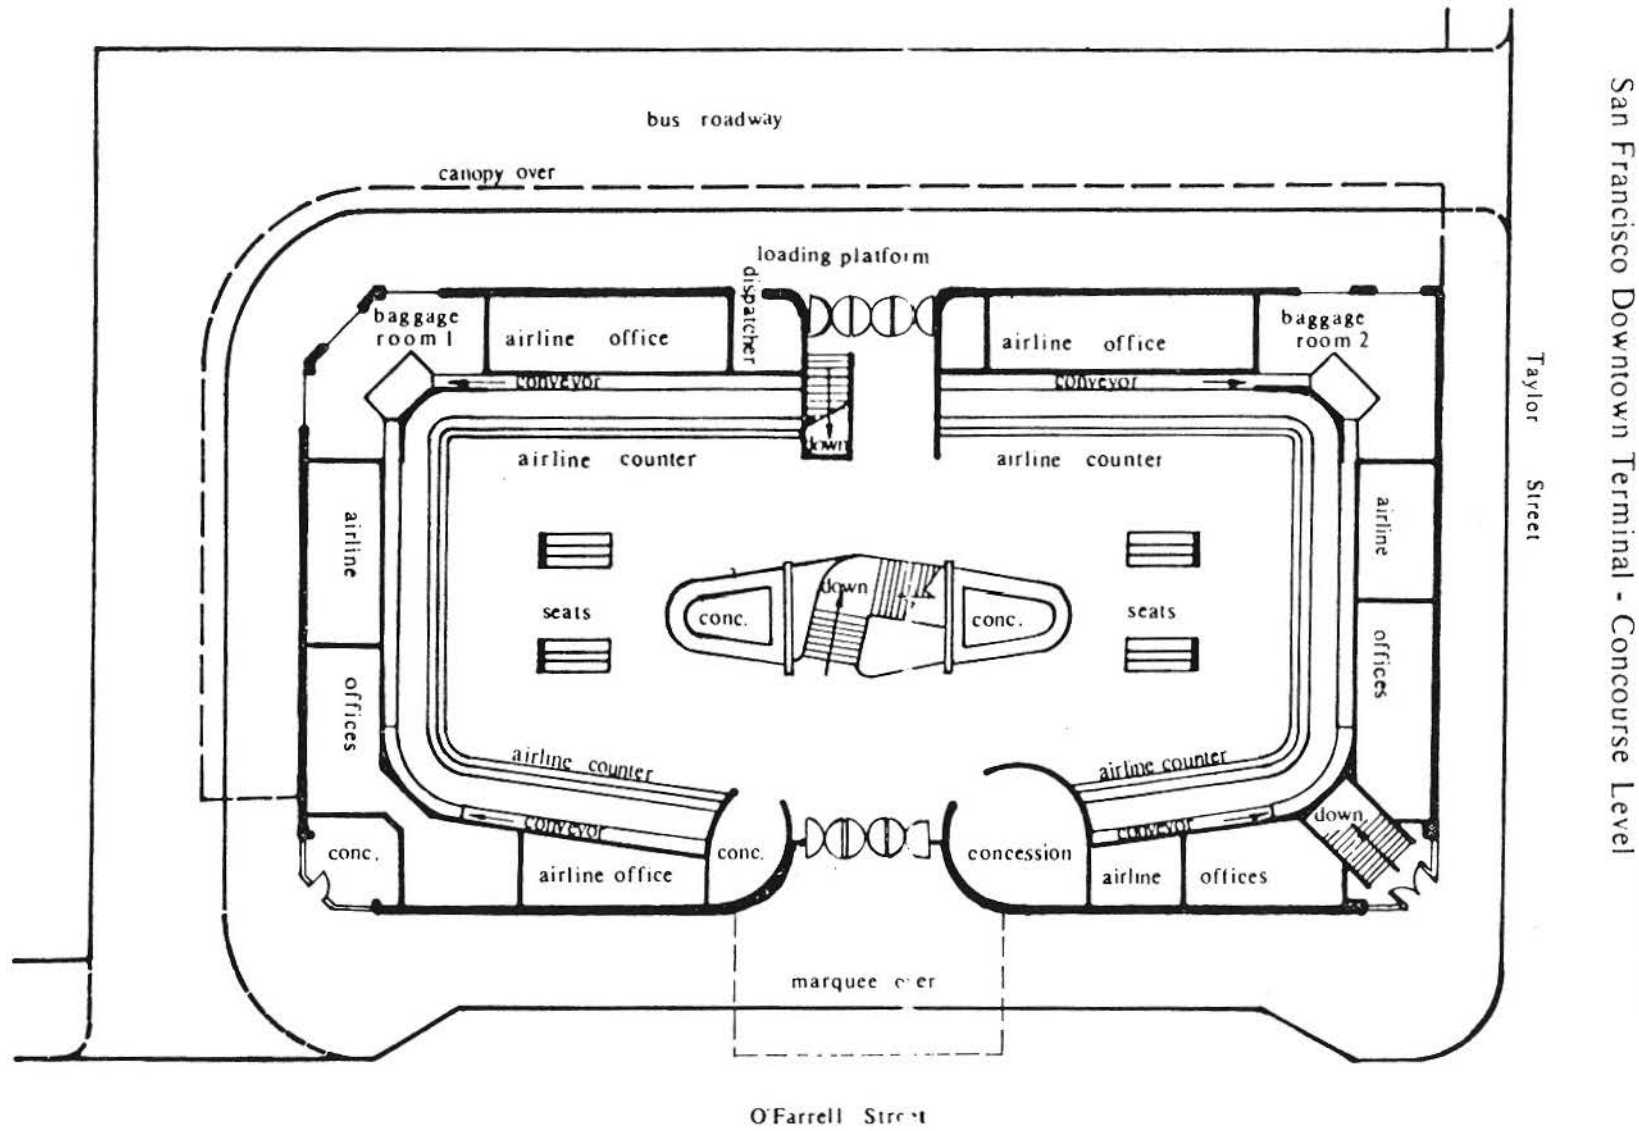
UPPER LEVEL FLOOR PLAN OF THE SAN FRANCISCO DOWNTOWN TERMINAL
